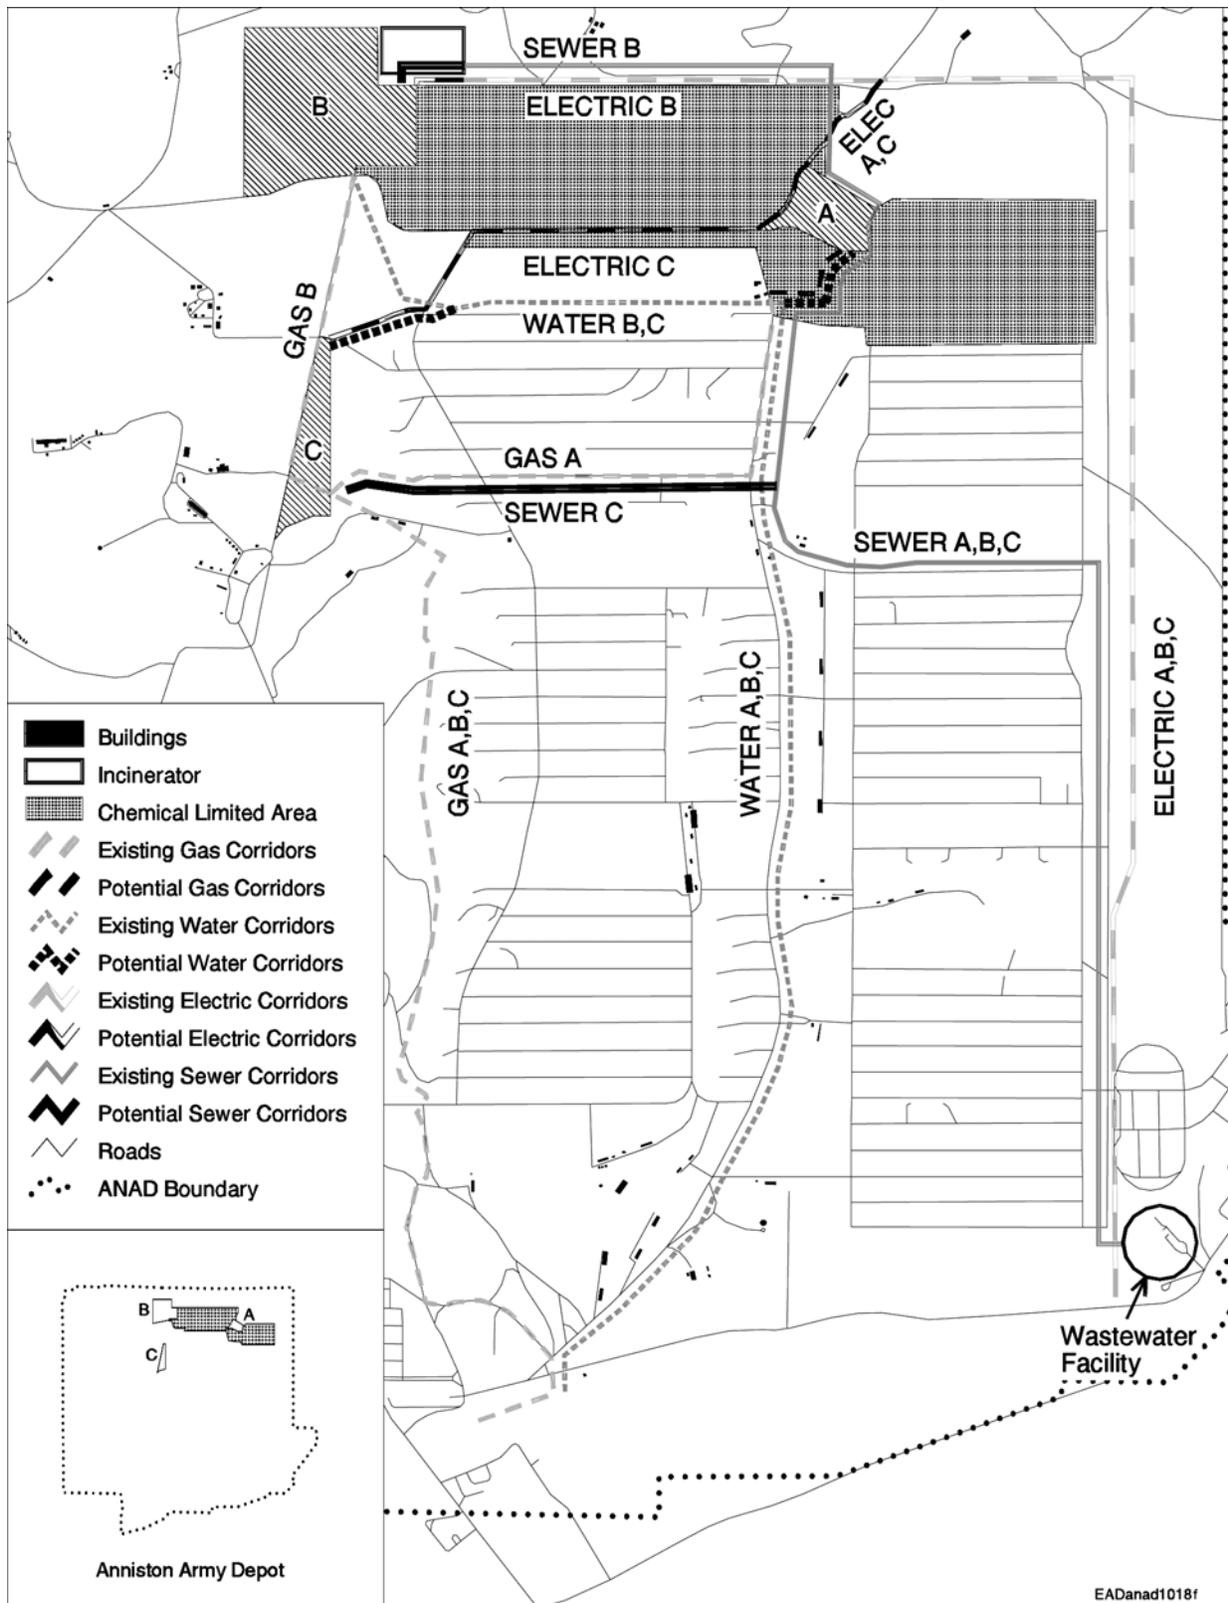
Proposed Utility and Road Access Corridors for an ACWA Pilot Test Facility at ANAD
